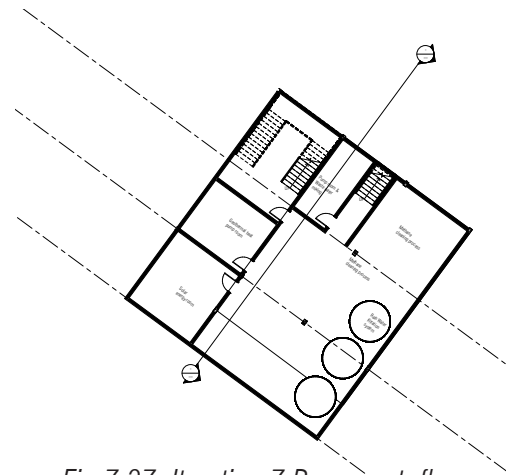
Iteration 7 Basement floor plan (Author,2020)
